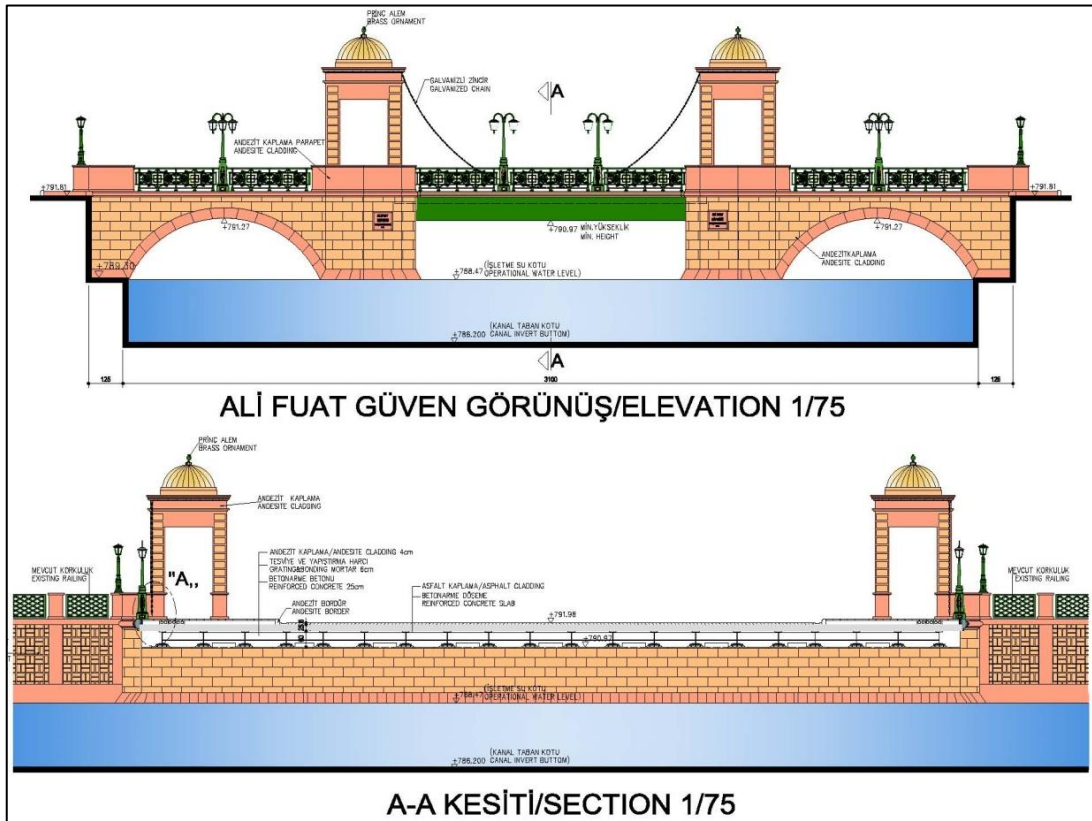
Ali Fuat Güven Bridge Elevation and Cross Section
